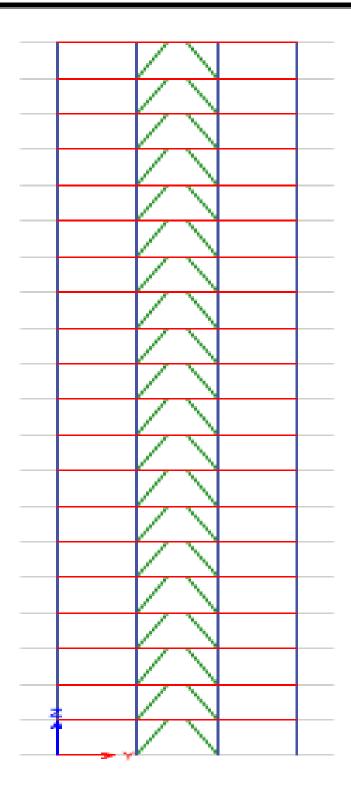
Elevation of eccentric frame{eccentric is equal to 1 m}
